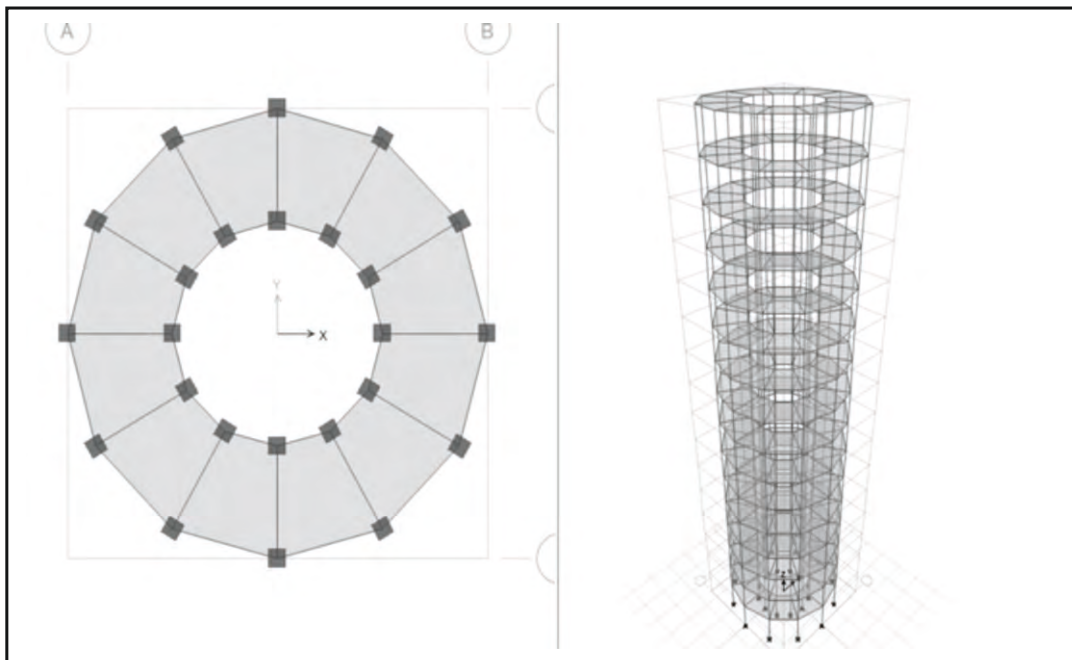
Plan and 3-D view of Circular Diagrid Building
